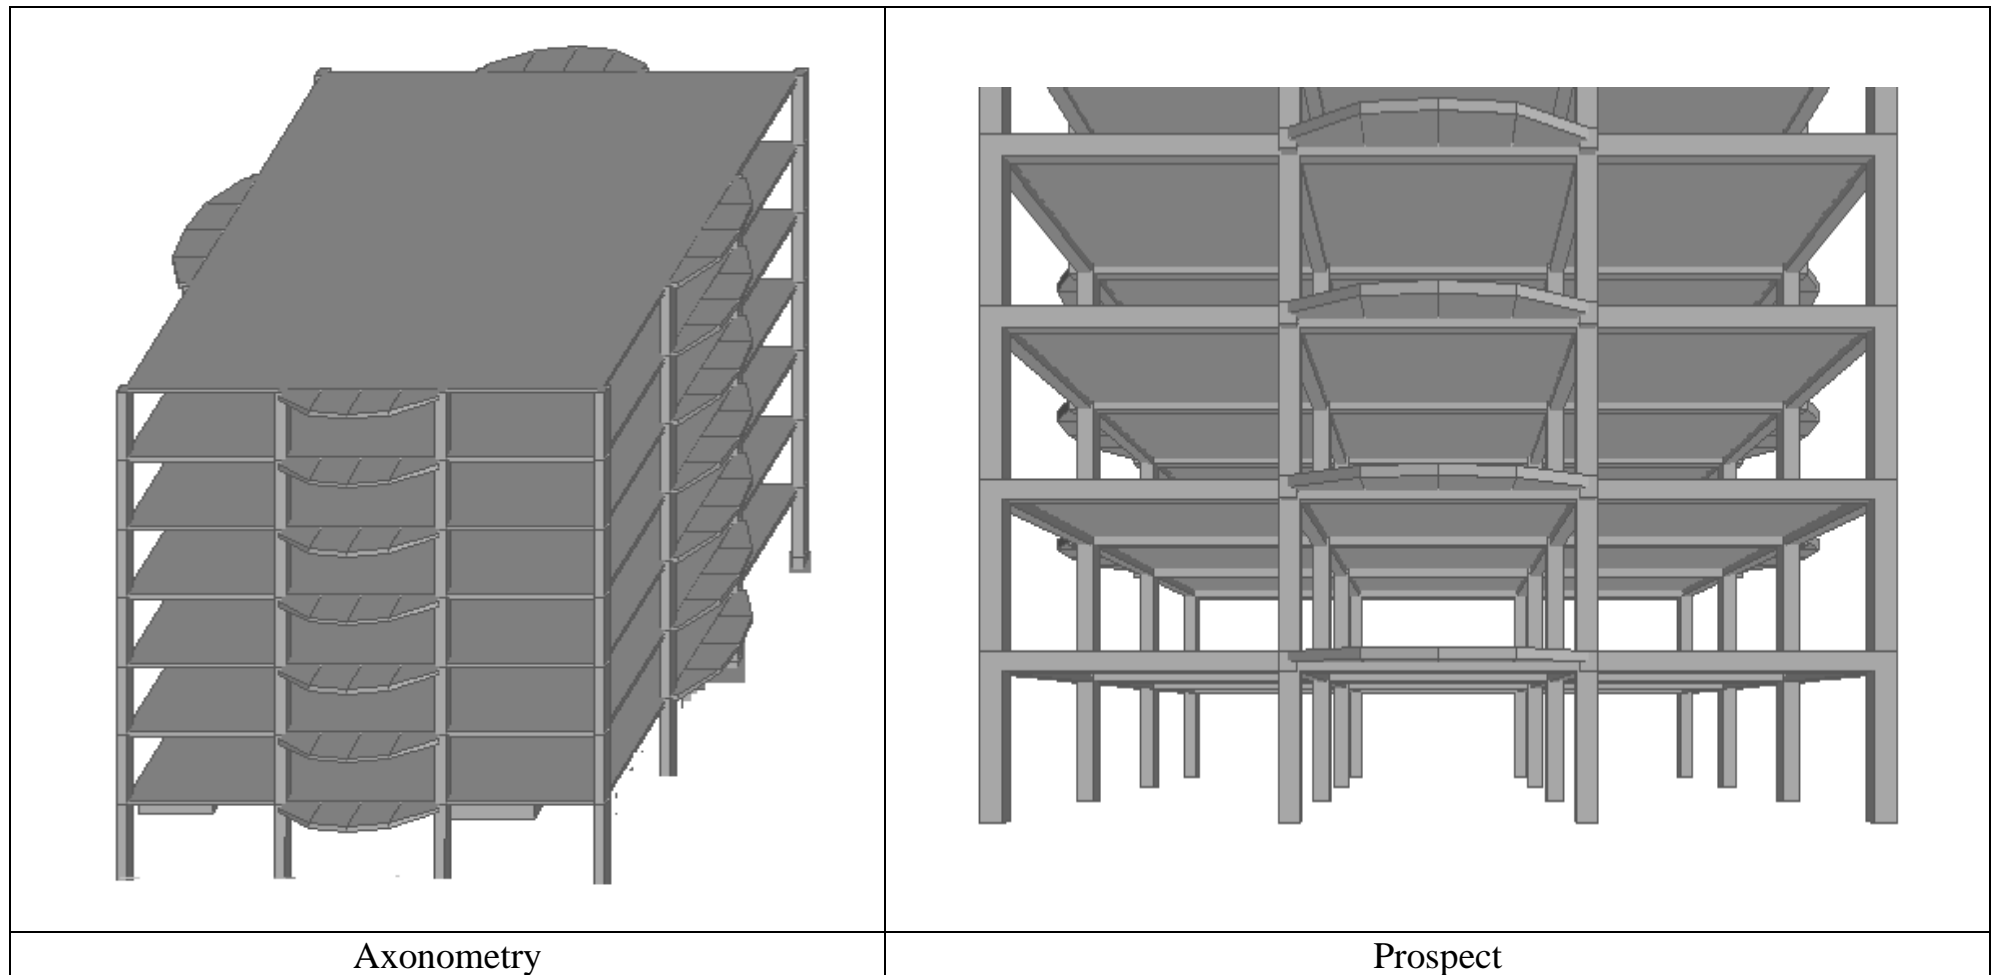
Model of a building with beams-slab floors. Note: foundations are simply shown
